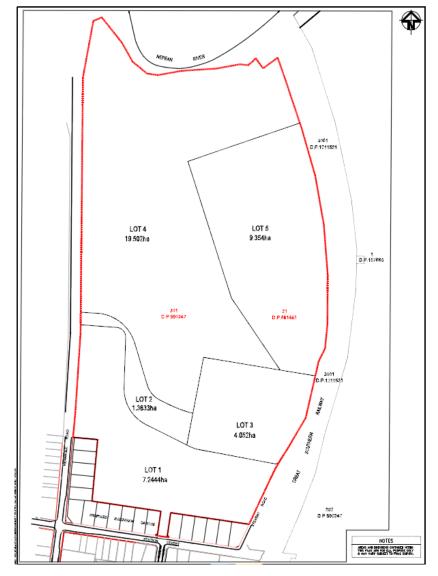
Subdivision Plan (Source: Calibre 2018)
